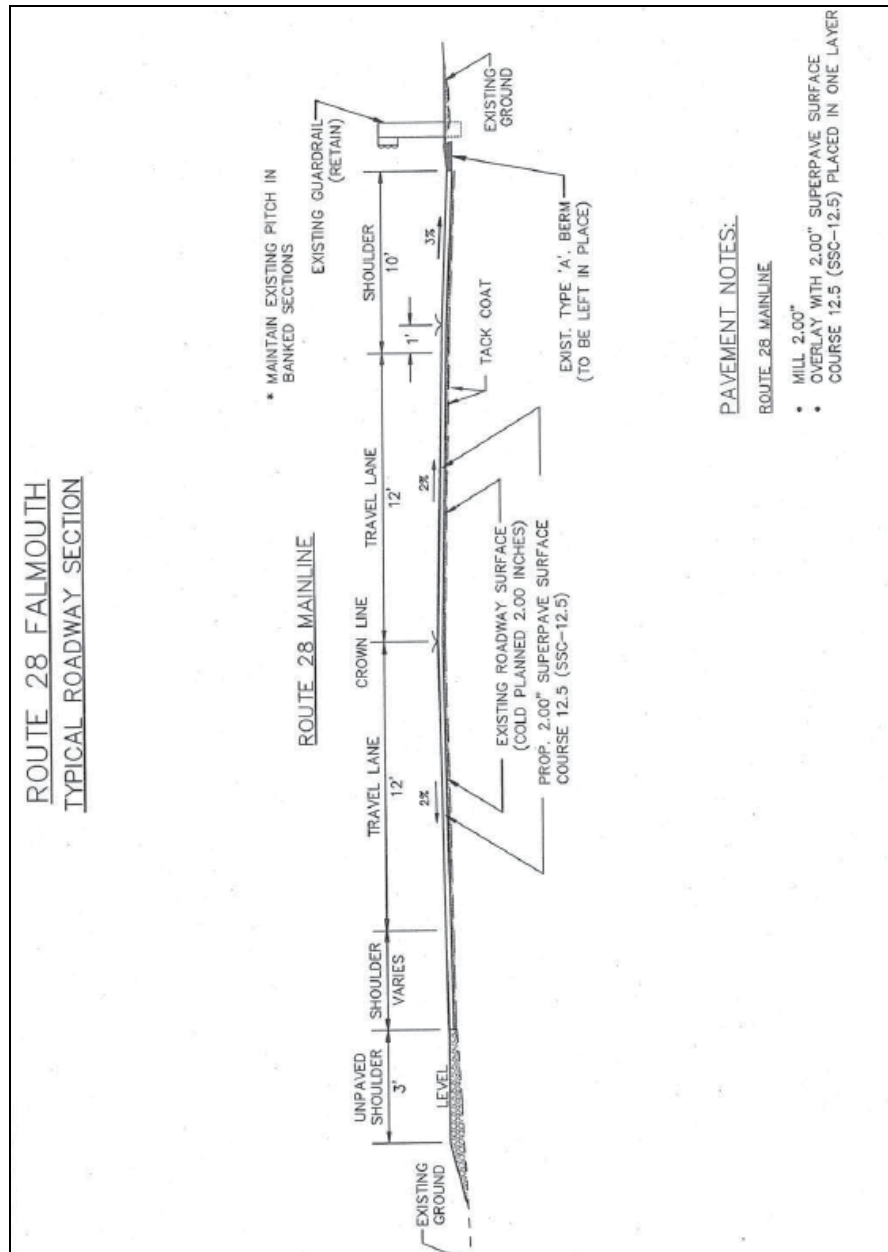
P12 typical section detail, Route 28 Falmouth
